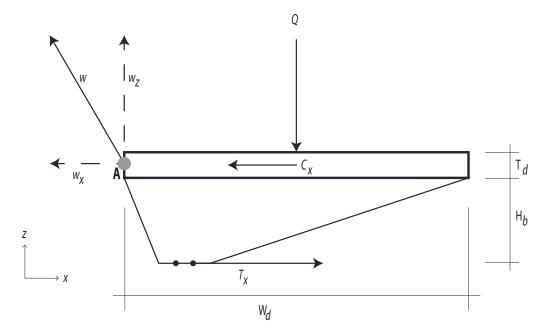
Priciple equilibrium of forces in a cross-section of the bridge
